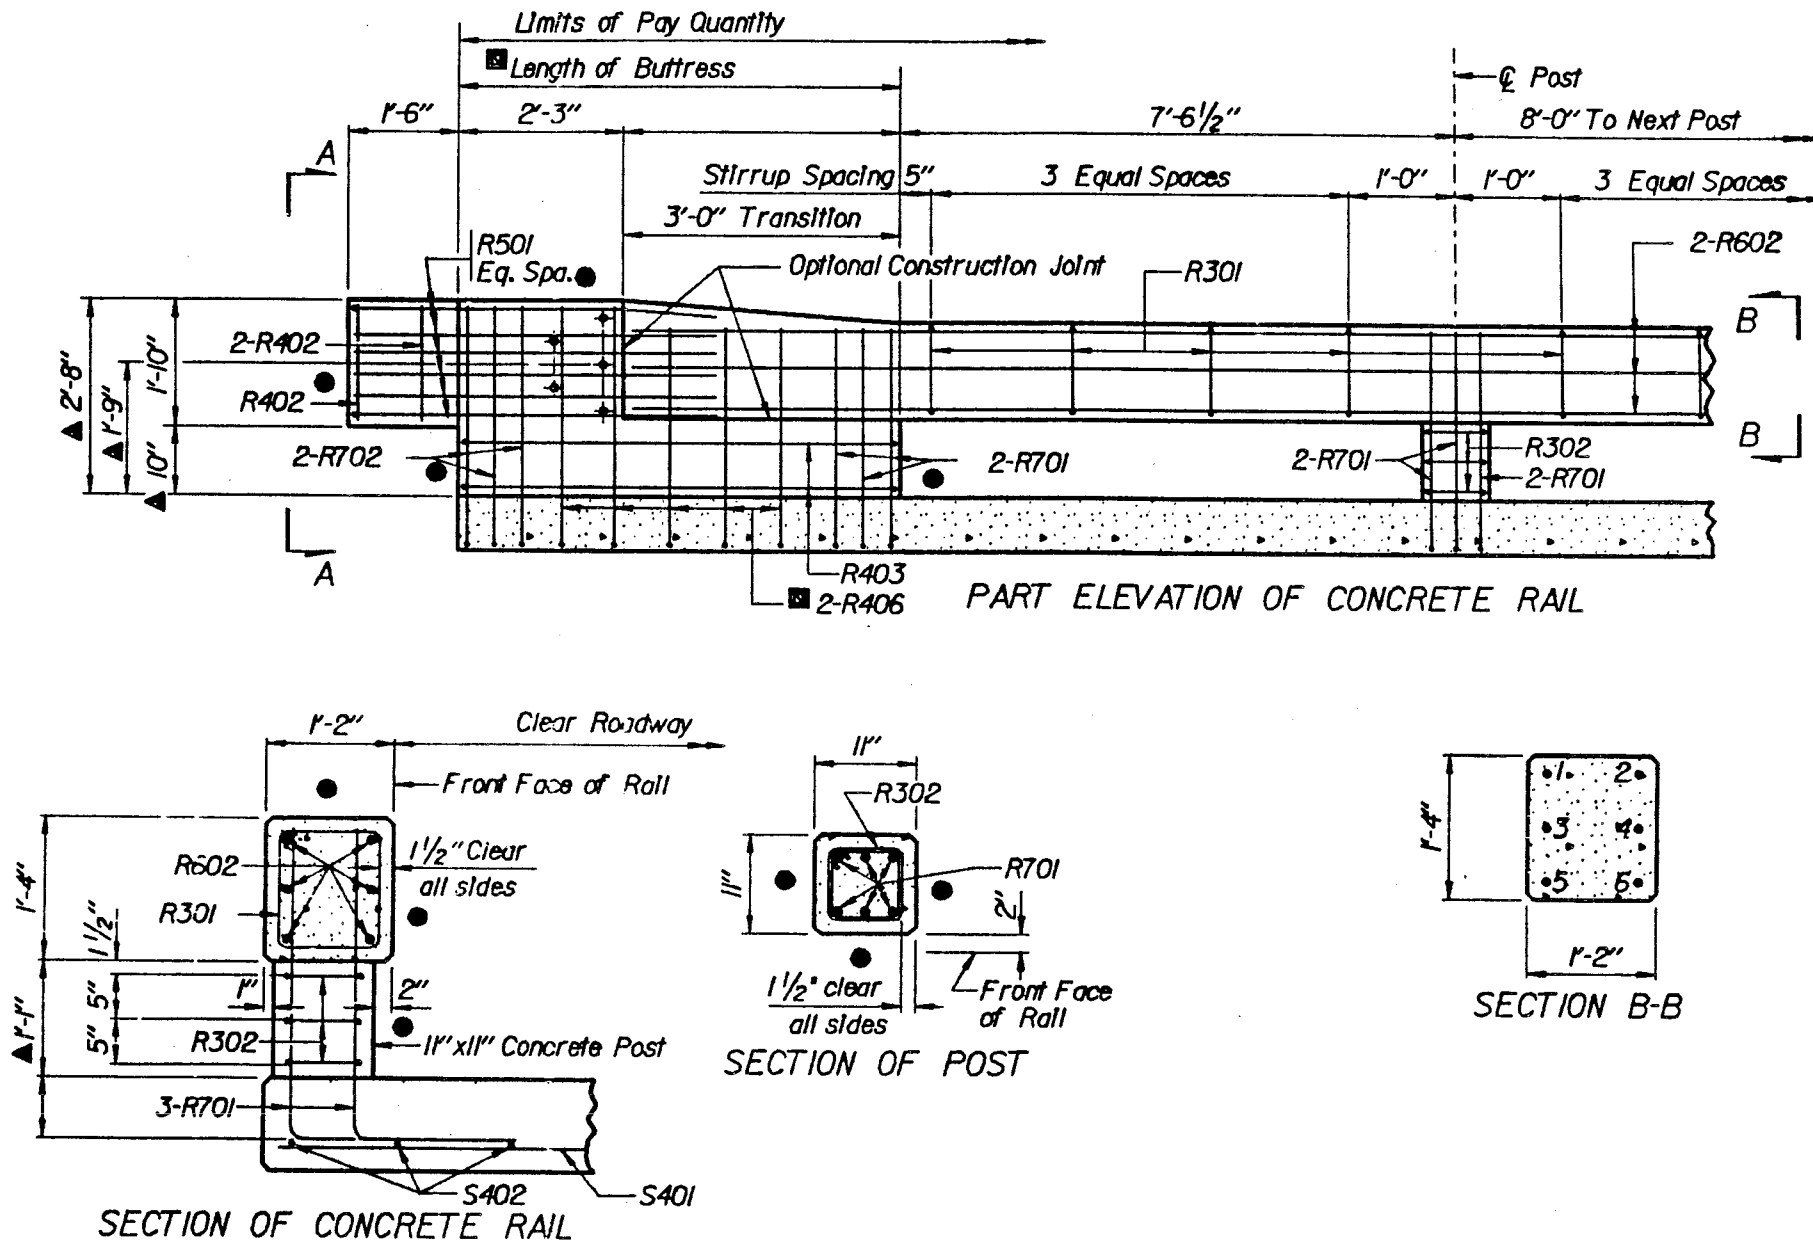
Nebraska Concrete Beam and Post Bridge Railing (54,55,56).
